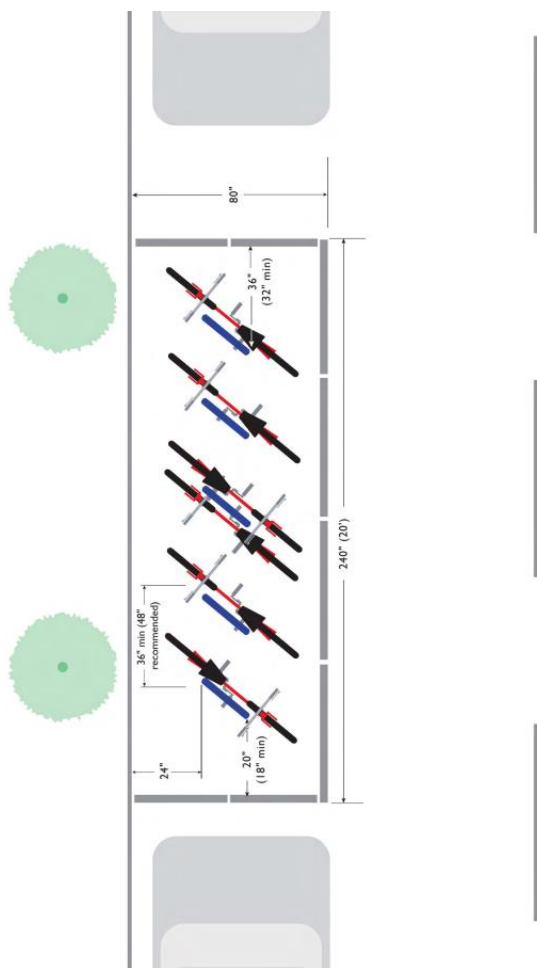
Typical Layout of a Bike Parking Corral (Source: APBP²)
